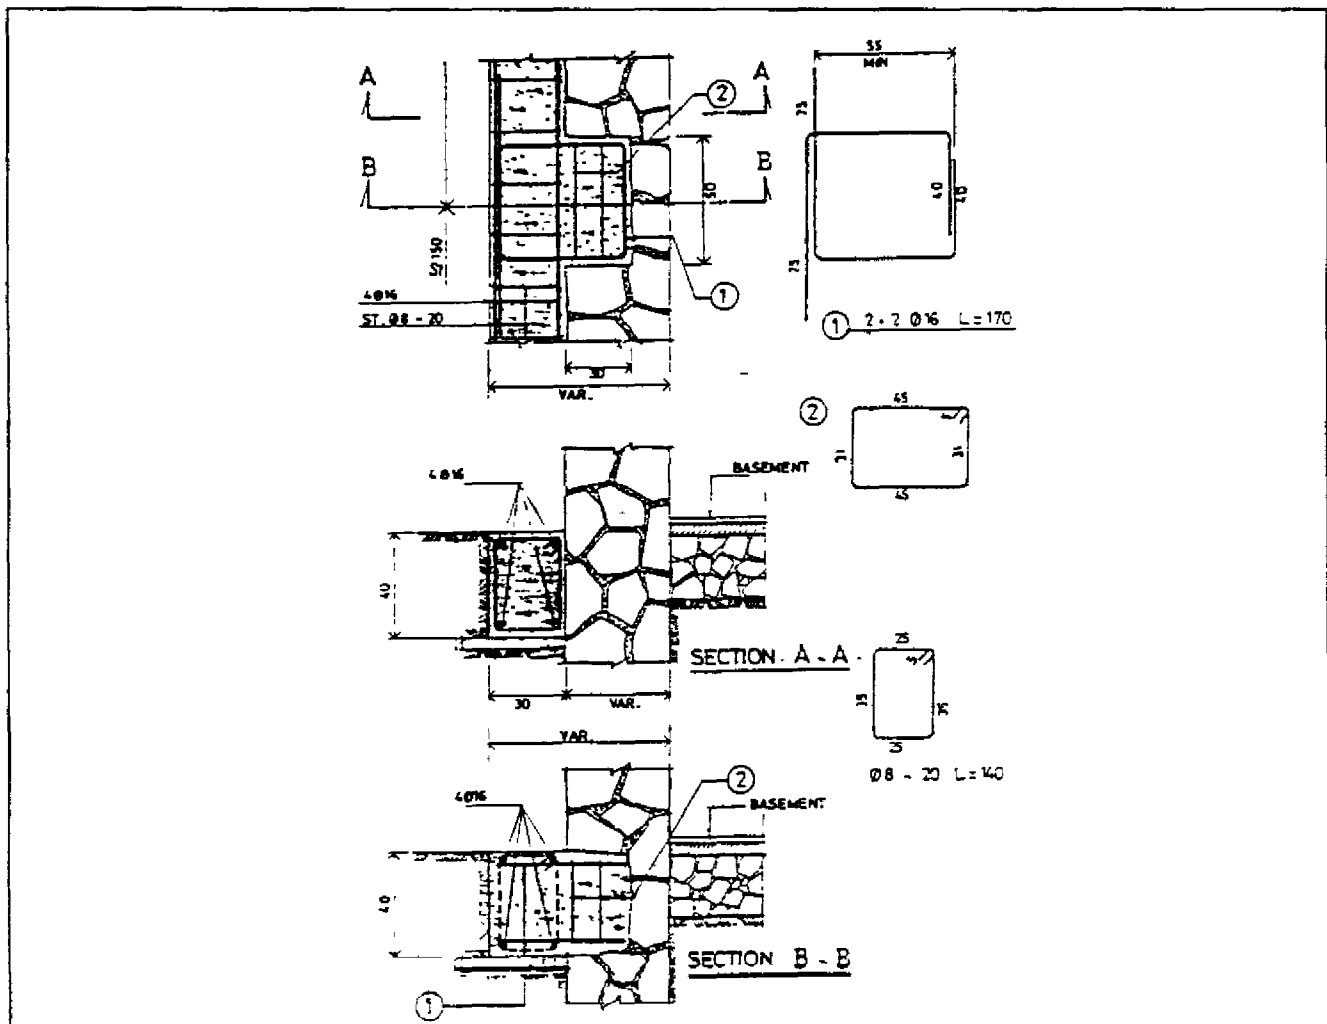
Strengthening Existing Foundation (R.C. Strip on Outside only)
